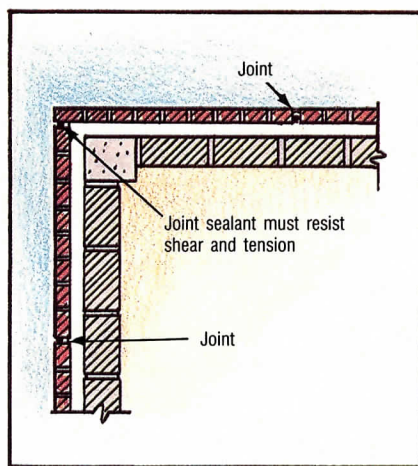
If an expansion joint is not constructed at a corner of two brick walls, the expansion of the walls will push the corner out and crack the wall at or near the corner.
